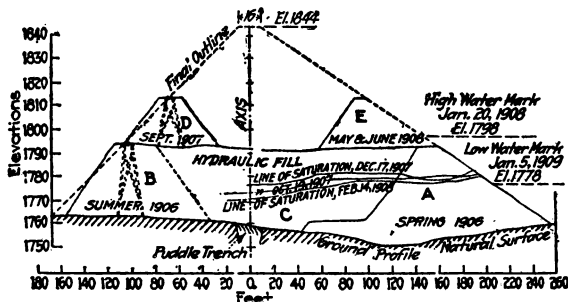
Section Through Lewiston-Sweetwater Lava Dam.
